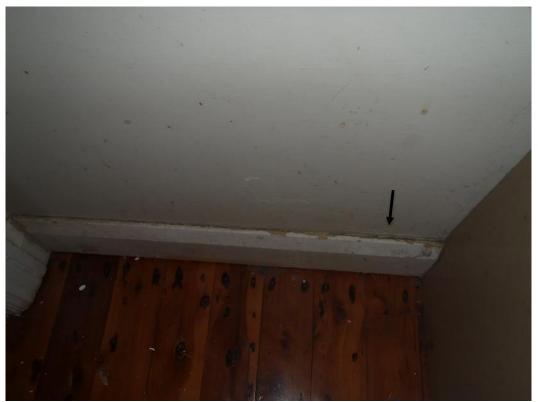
shows evidence of previous repairs to the plaster ceiling lining across the centre of the Lounge room.
